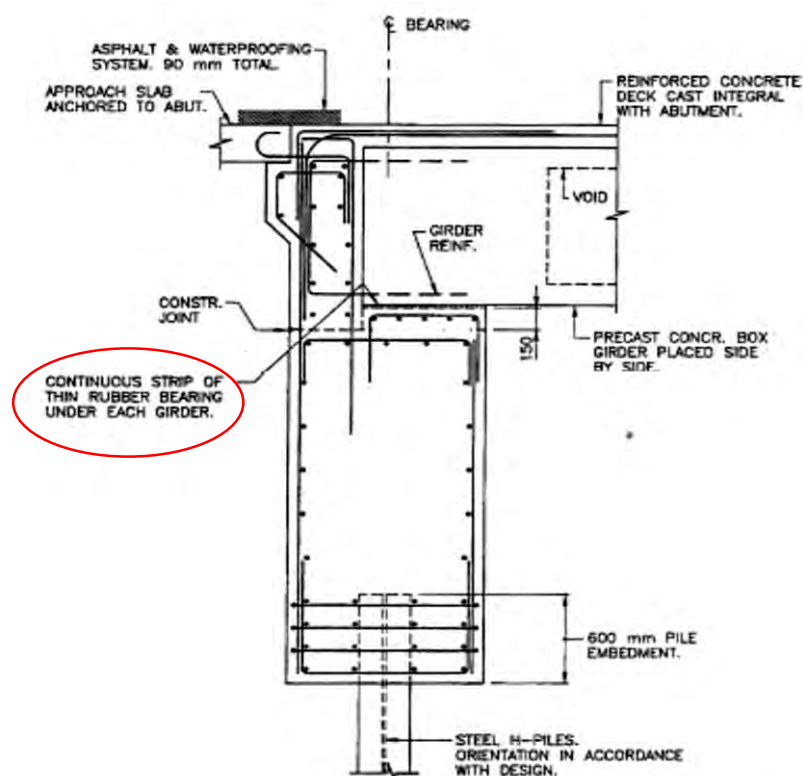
Integral abutment with precast concrete box girder and concrete deck - Ontario Ministry of Transportation (Husain & Bagnariol 1996)
